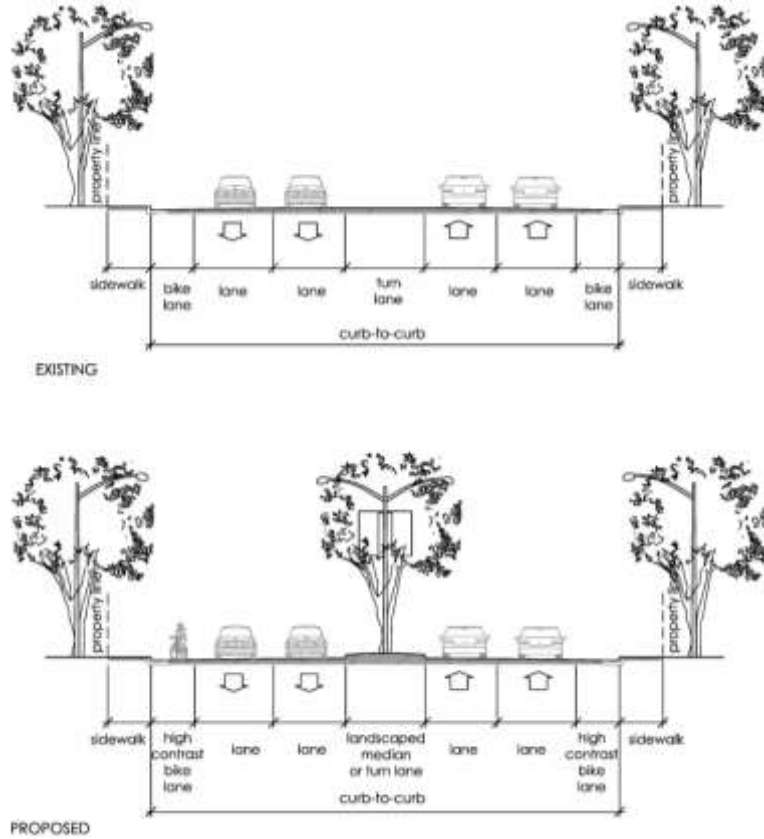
Commerce Boulevard Street Section at the Central Commercial Subarea
